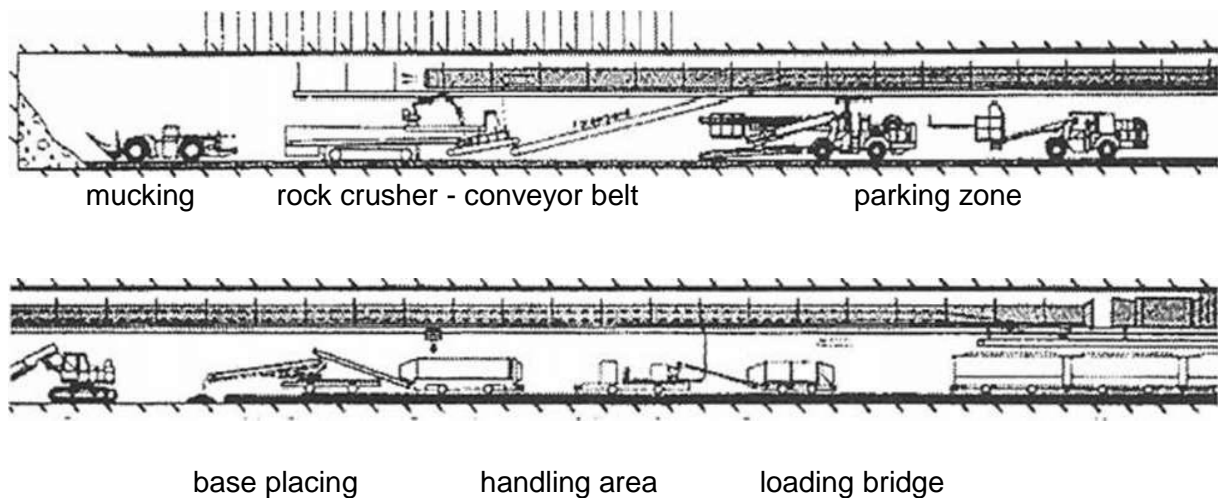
Back-up System Tunnel Vereina South (Switzerland)³⁶
